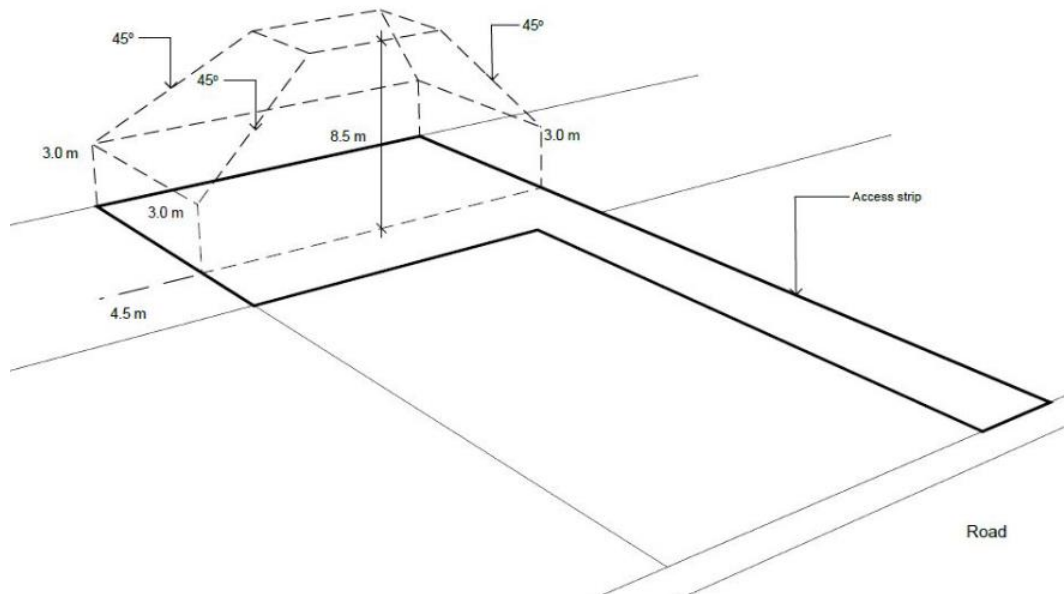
Building envelope for internal lots as required by clause 8.4.2 A3(a) and clause 8.5.1 A2(a)
